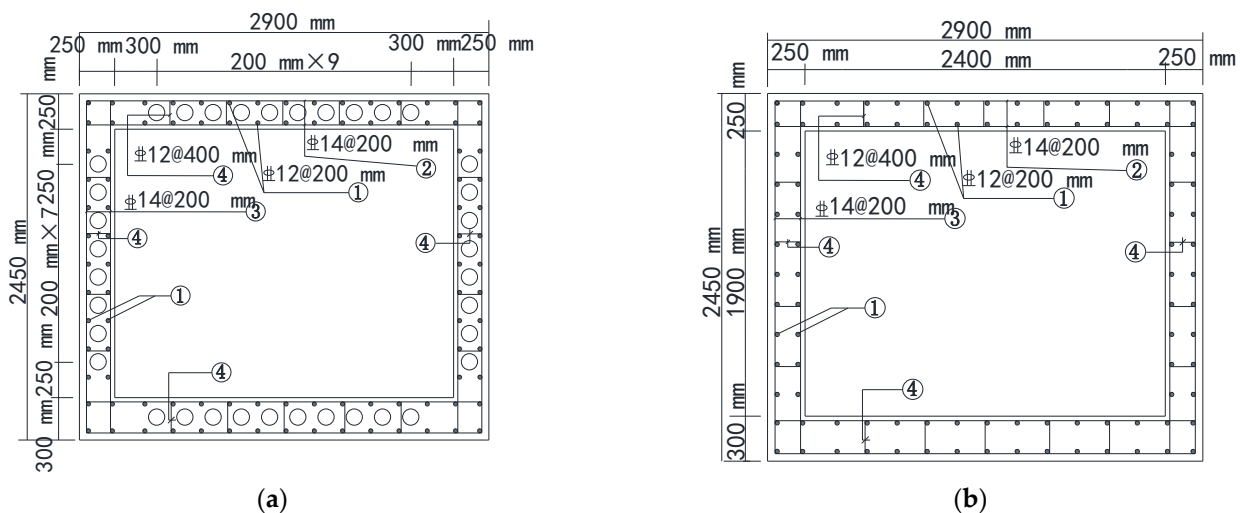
Reinforcement of utility tunnel specimens. (a) Reinforcement of ordinary specimens. (b) Reinforcement of hollow specimens.
